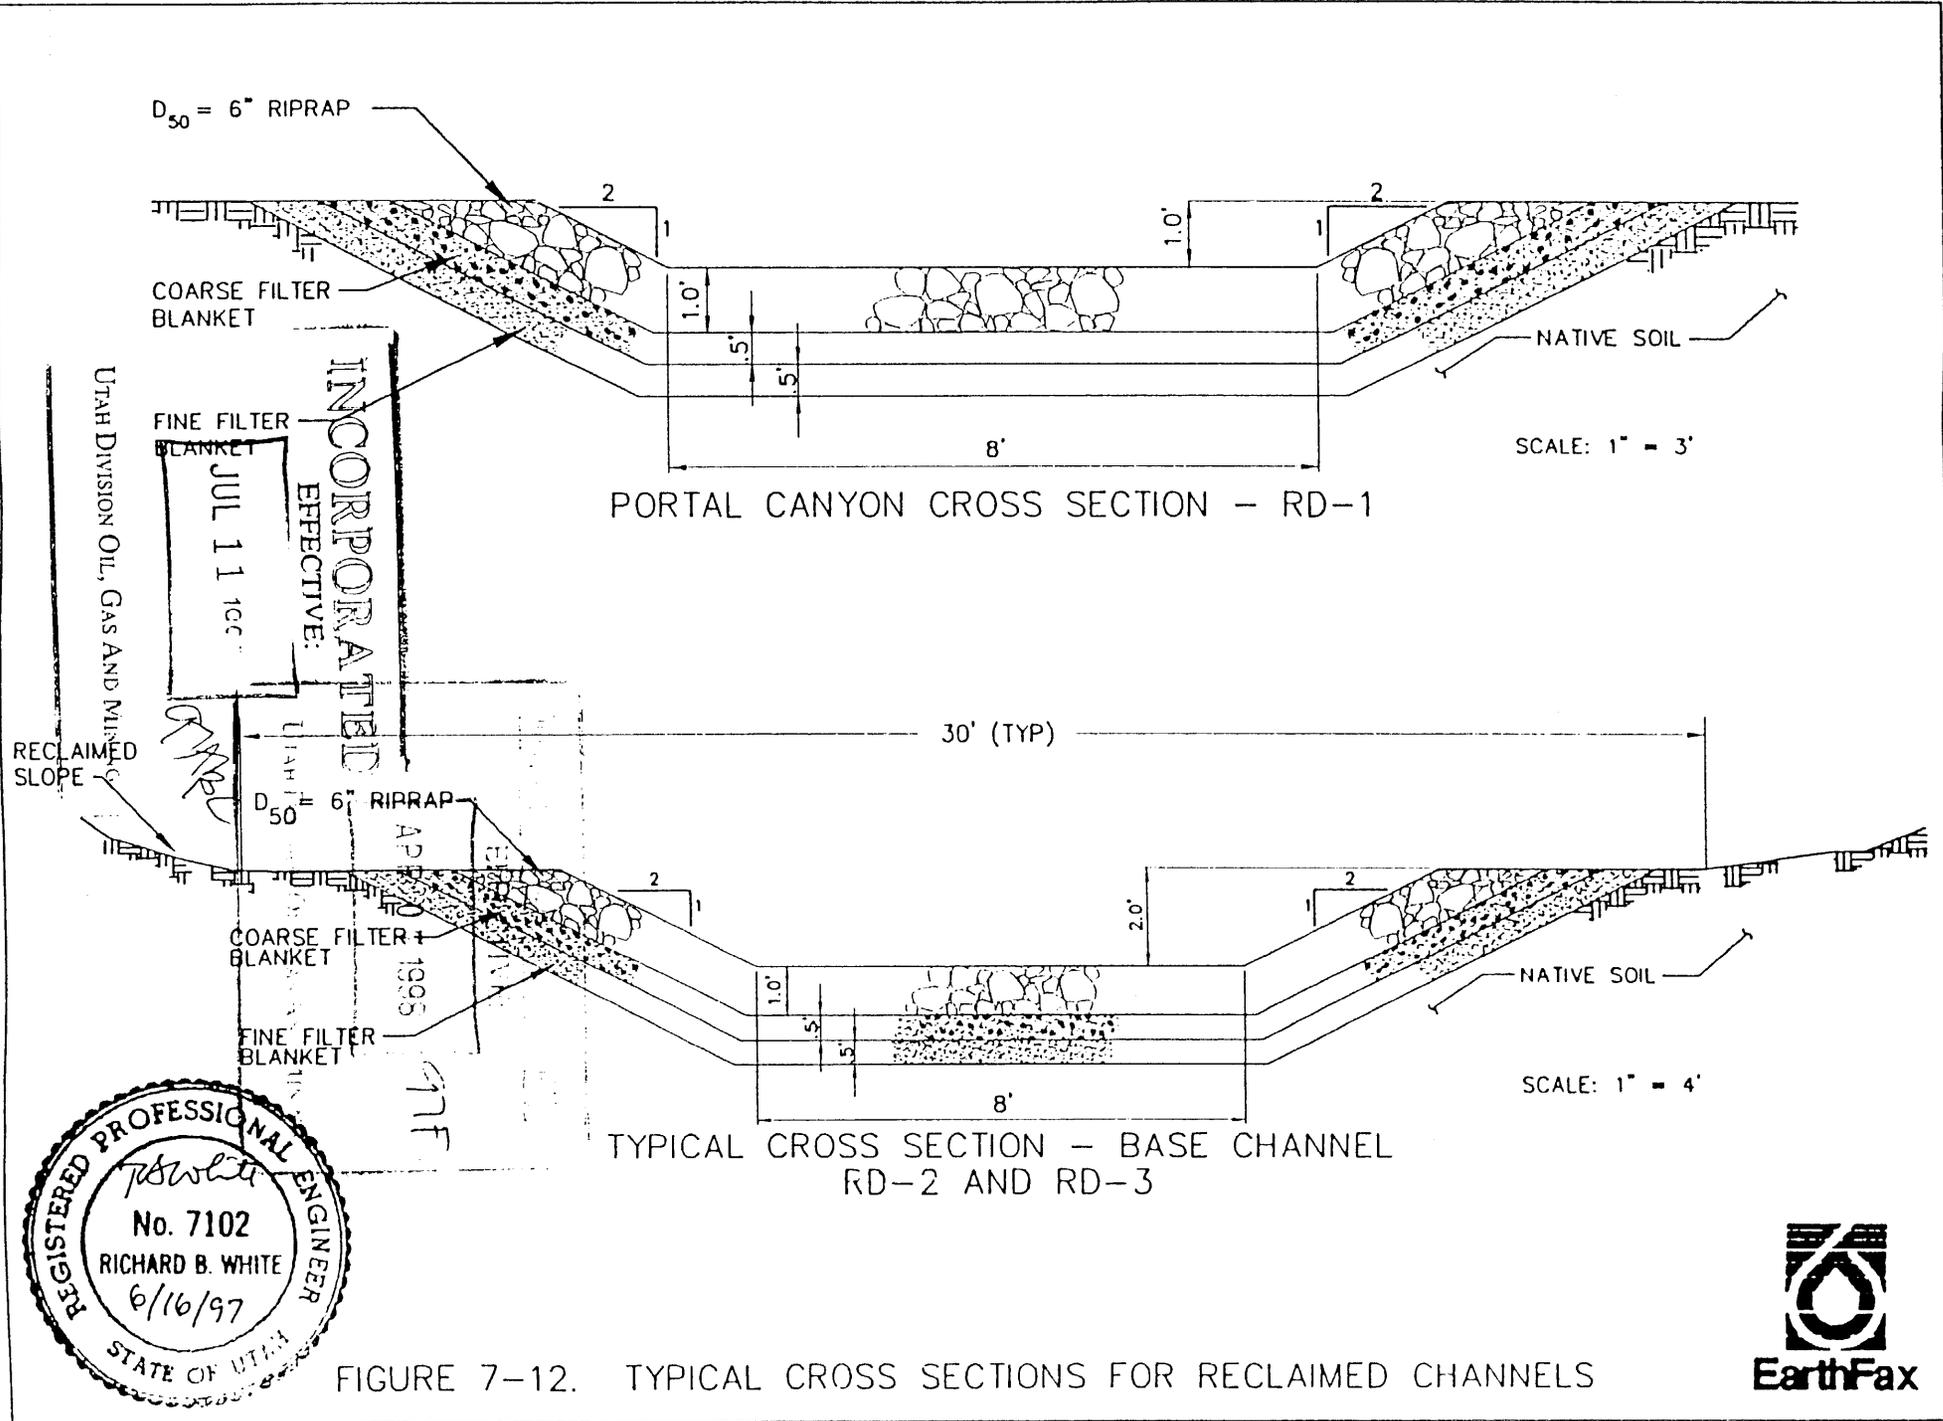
TYPICAL CROSS SECTIONS FOR RECLAIMED CHANNELS
